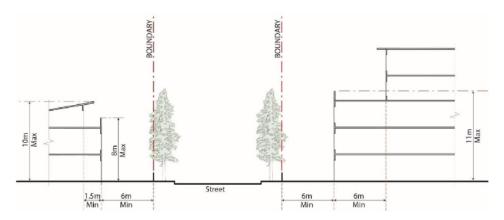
(b): Livingstone Street, Street Wall Height and Primary and Secondary Setbacks
